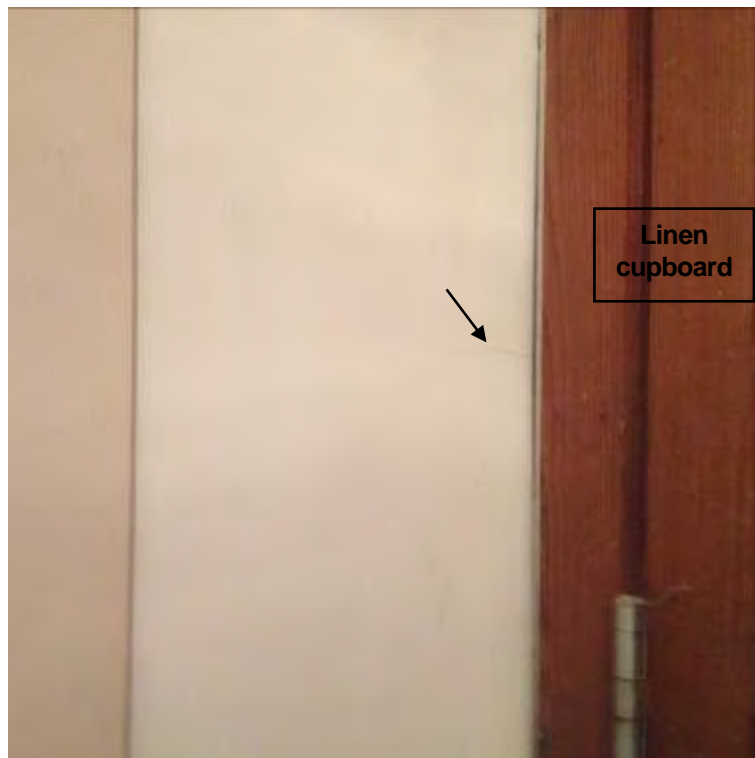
shows a hairline crack to the north wall of Bedroom 1
